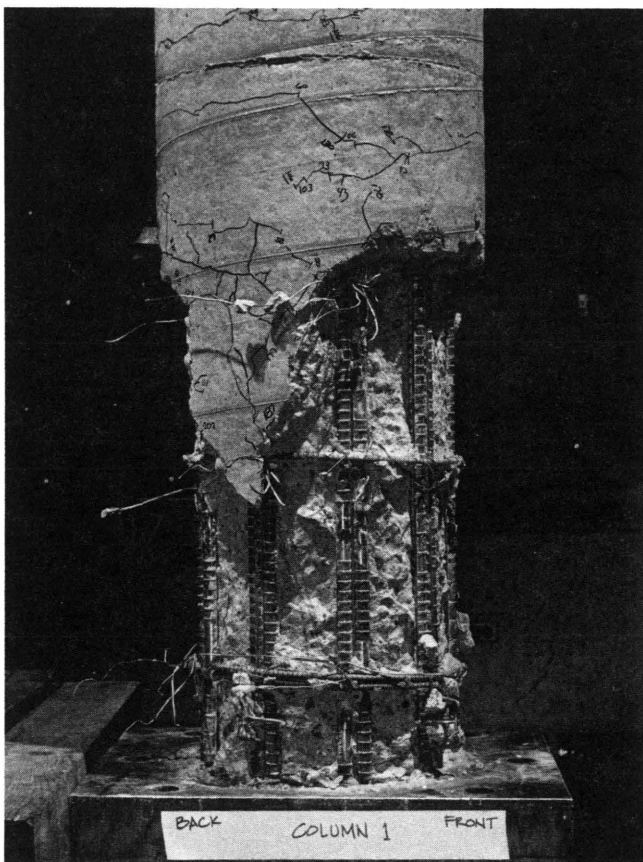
Column 1 elevation at completion of test: cover spalled but did not fall off and was easily removed manually for visual inspection.
